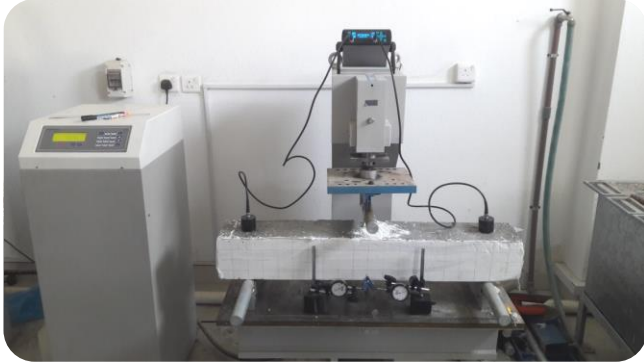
Fracture test setup with mechanical dial gauges – third point loading
